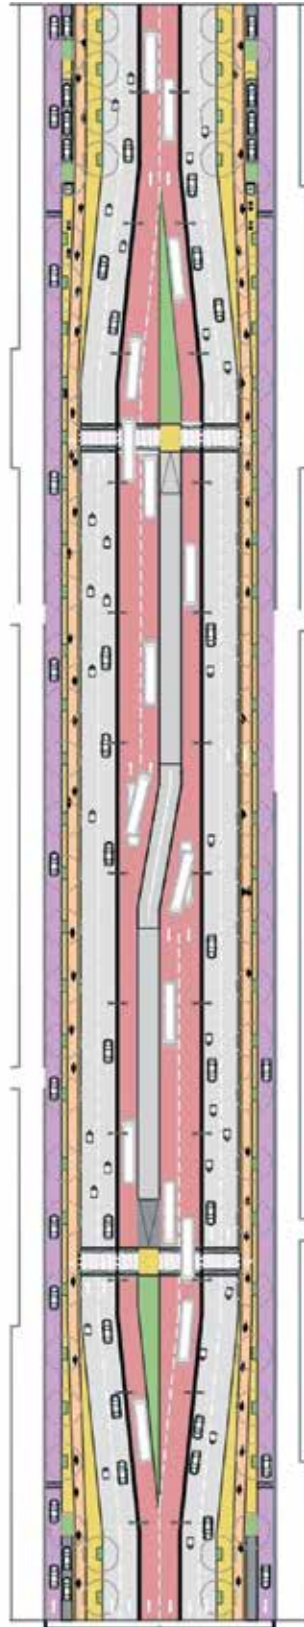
Plan view of a typical BRT configuration with passing lanes (42 m street)
